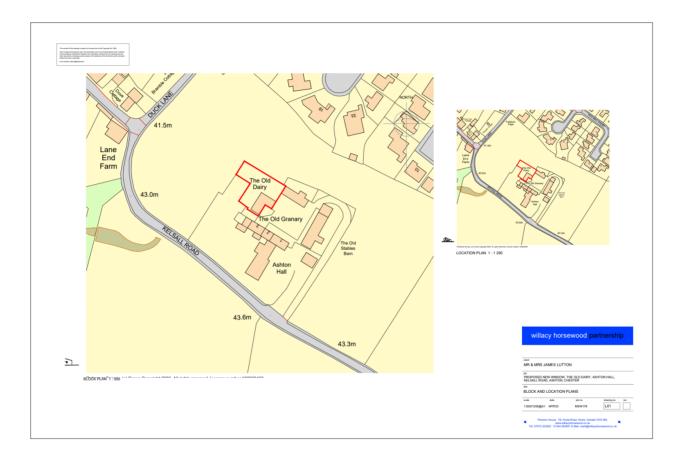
Location and site plan (Copyright: Willacy Horsewood).
